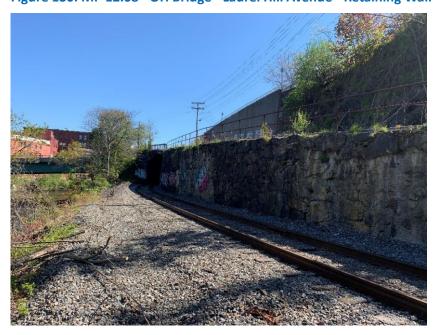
MP 12.08 - OH Bridge - Laurel Hill Avenue - Retaining Wall
